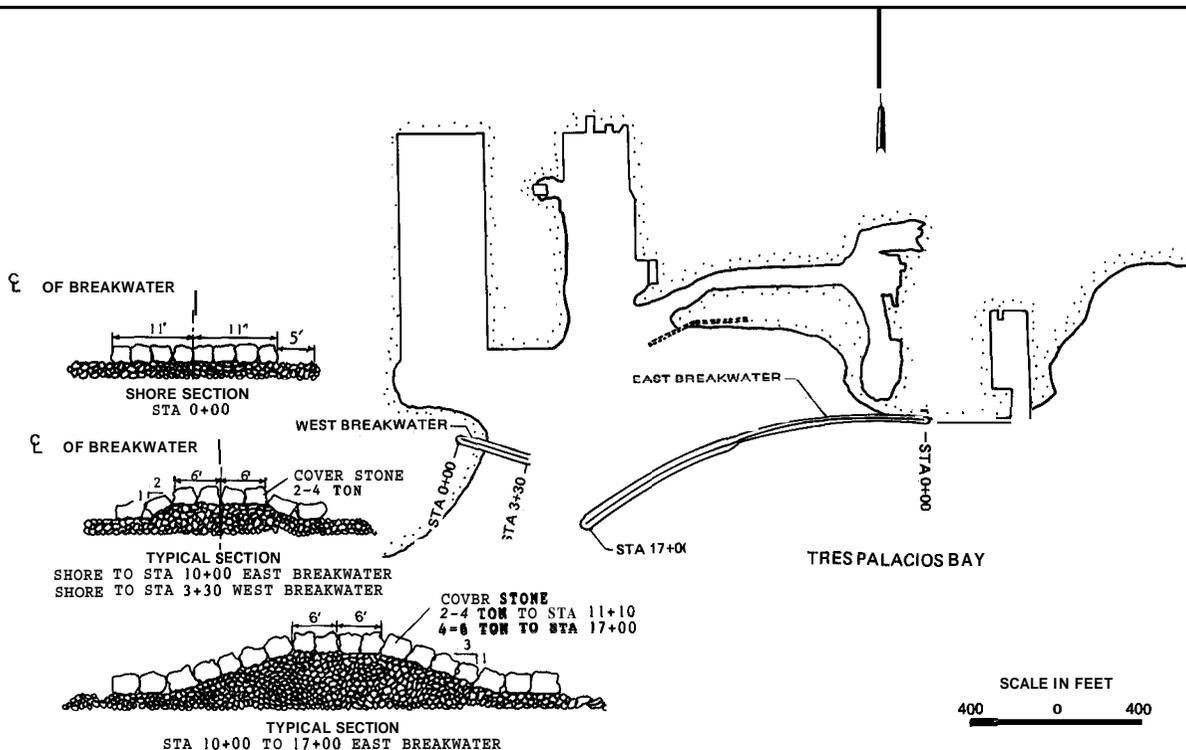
Plan view of Palacios Harbor and typical breakwater cross sections
